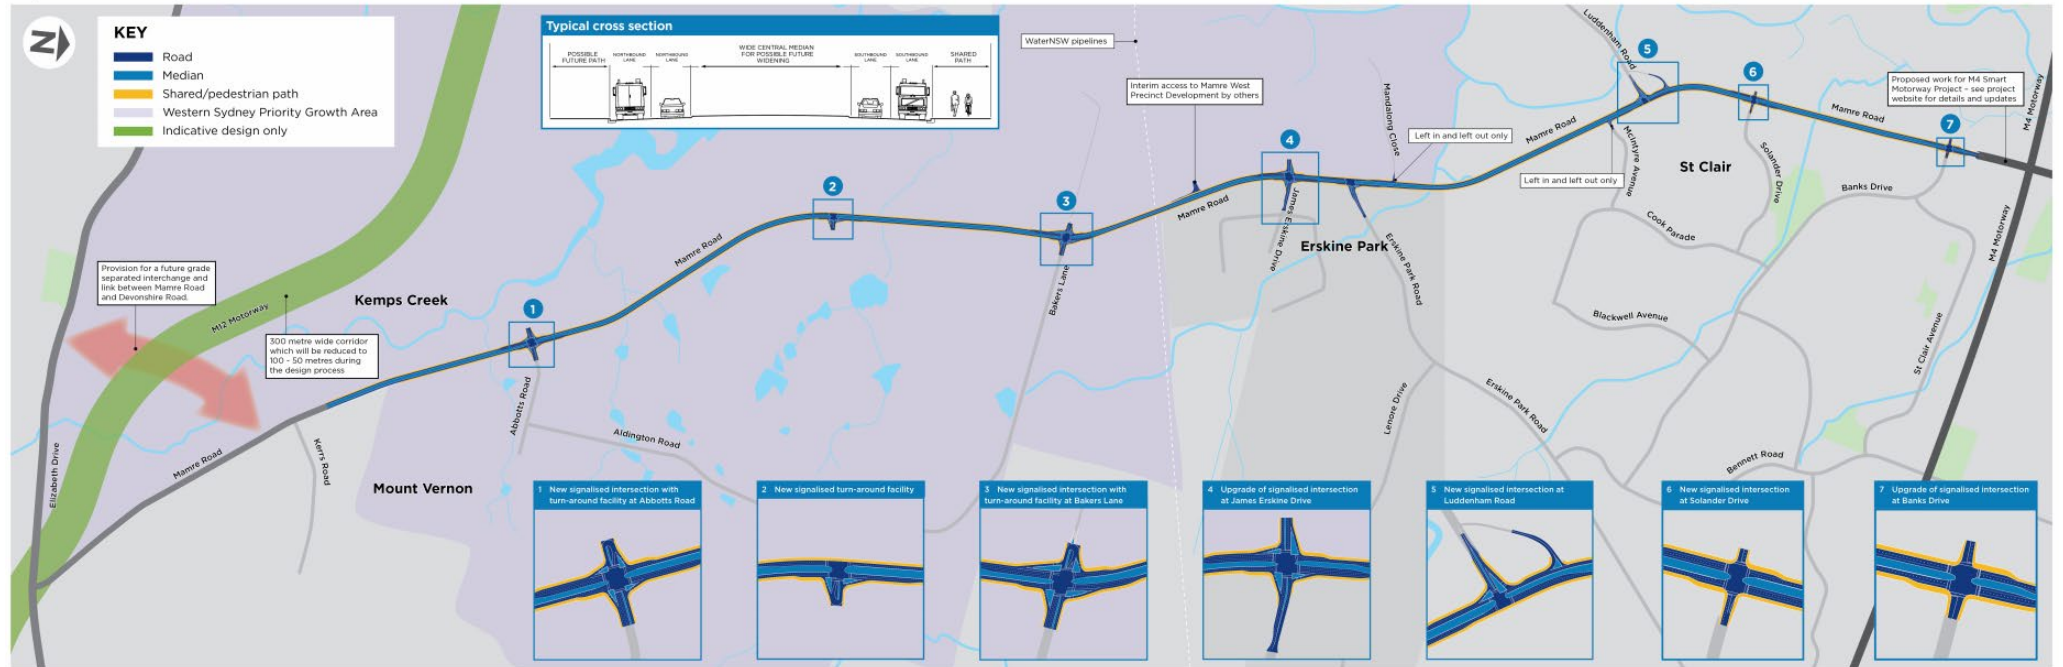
Broader program of work – proposed Mamre Road upgrade design (as per strategic design)
